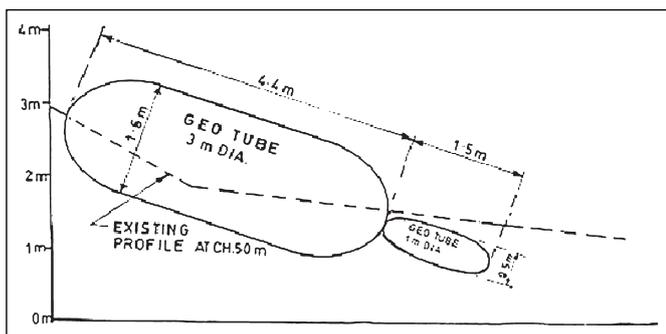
Cross-section of sand-filled geotextile tube seawall at Devbag, Maharashtra
